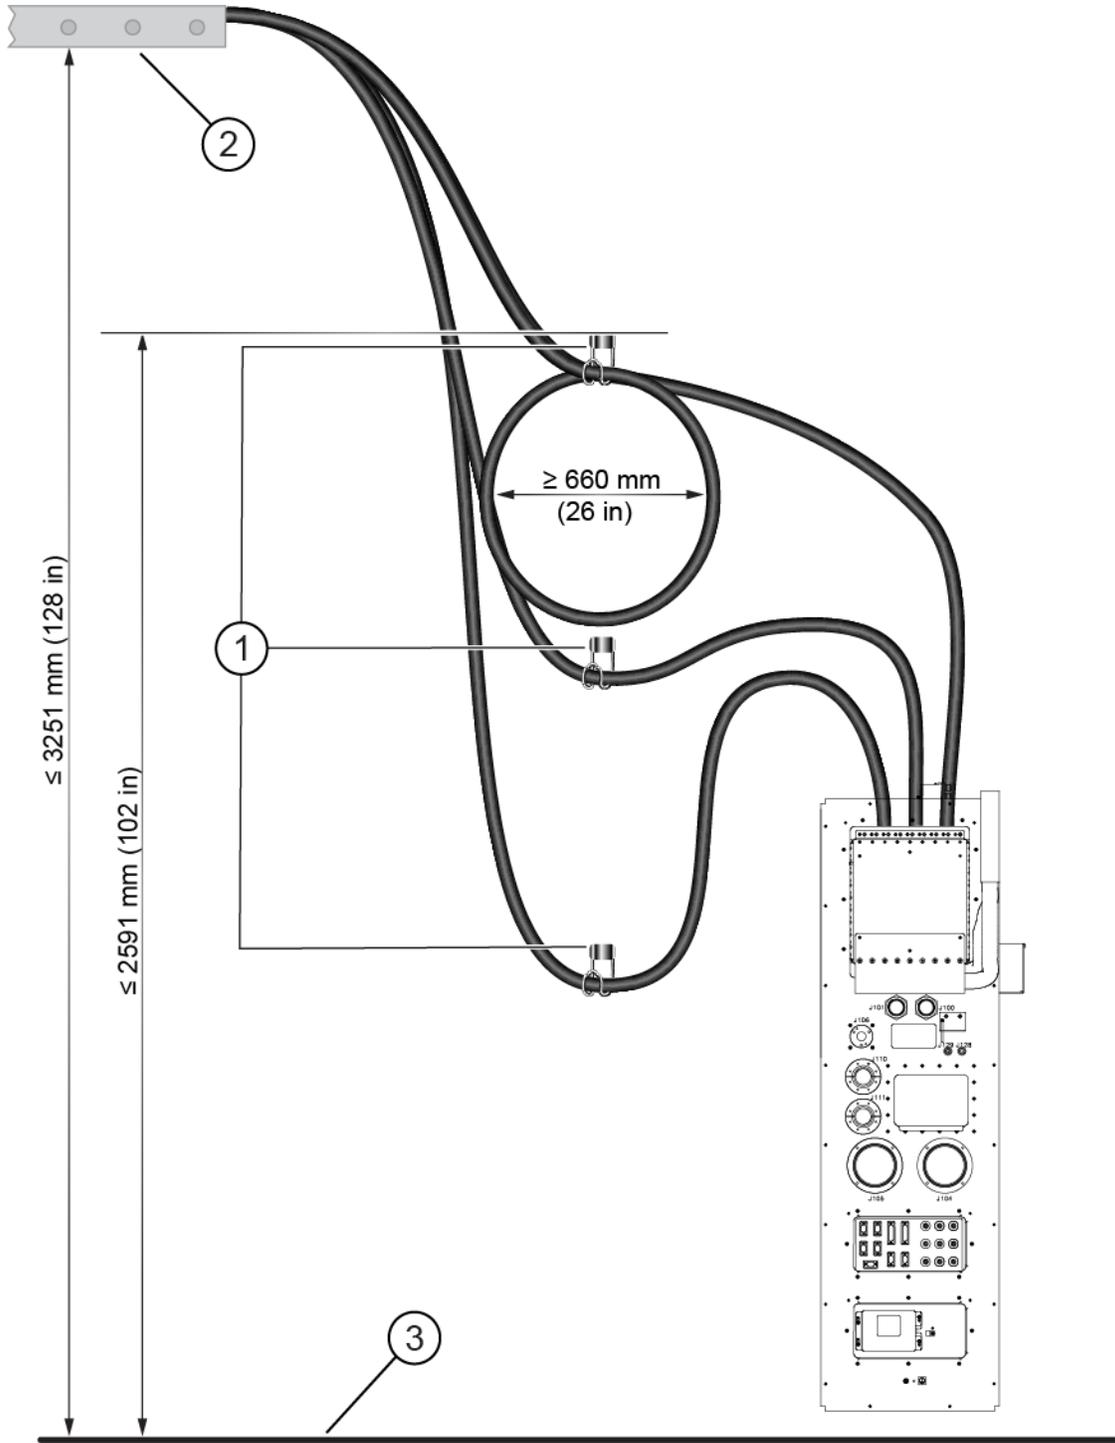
Gradient Cable Mounting Hook Mounting Detail
